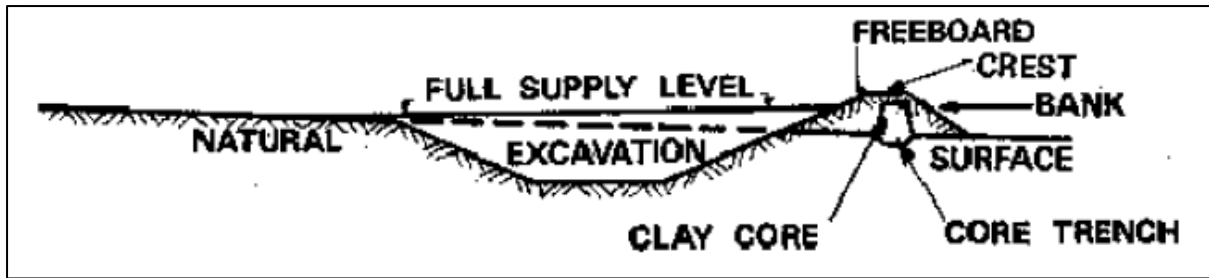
| CROSS SECTION OF A TYPICAL HILL SIDE DAM (EYRE PENINSULA NATURAL RESOURCES MANAGEMENT BOARD, 2011)
